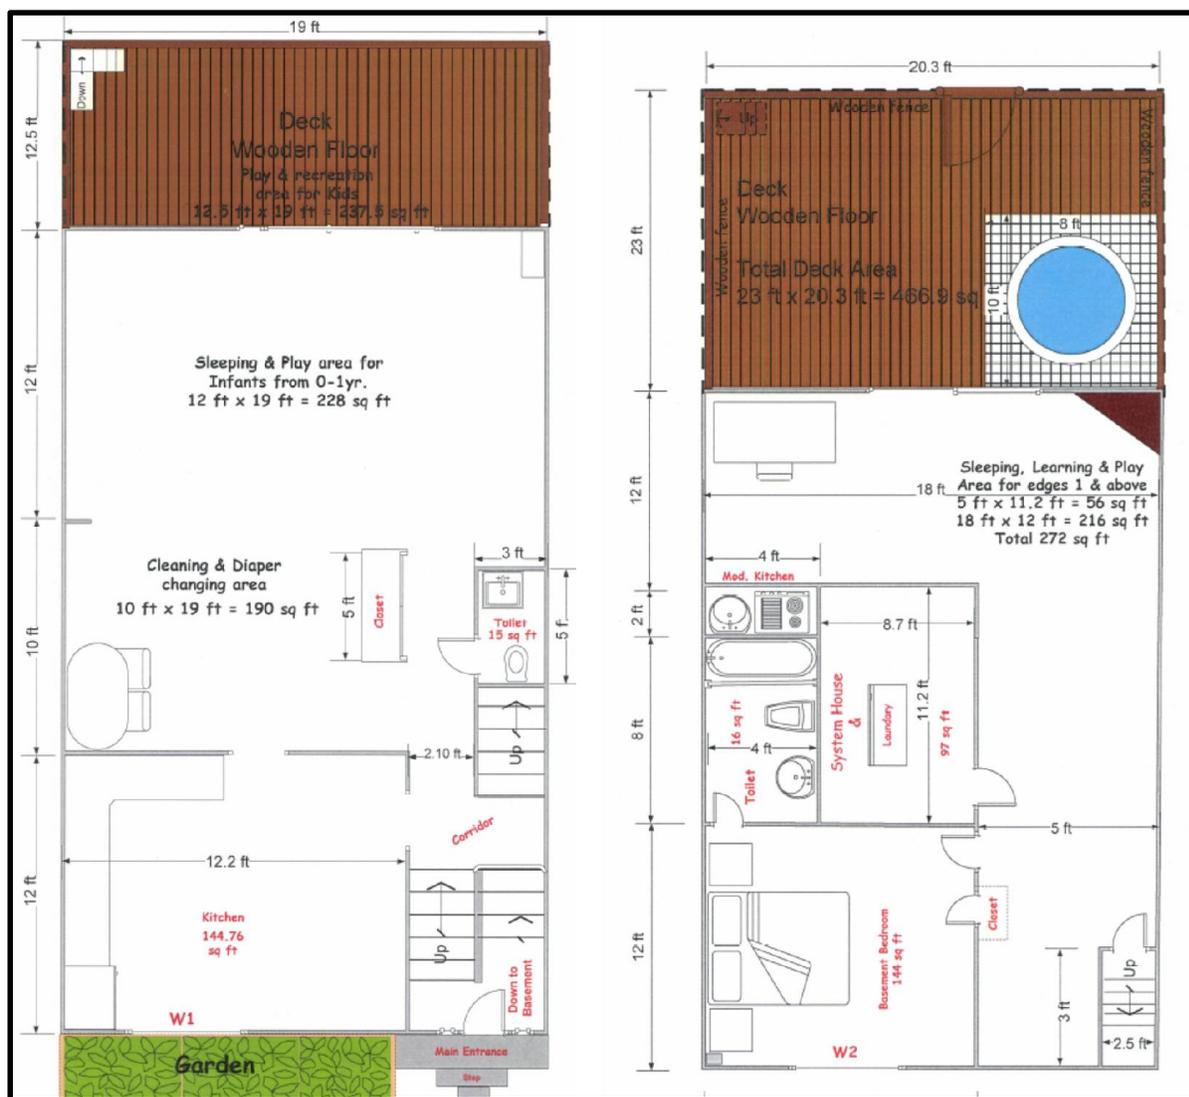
Floorplan for existing home child care facility and proposed expansion. The first floor (left) is the existing facility and the basement level (right) is the proposed expansion, which is all one room. Source: Applicant.
